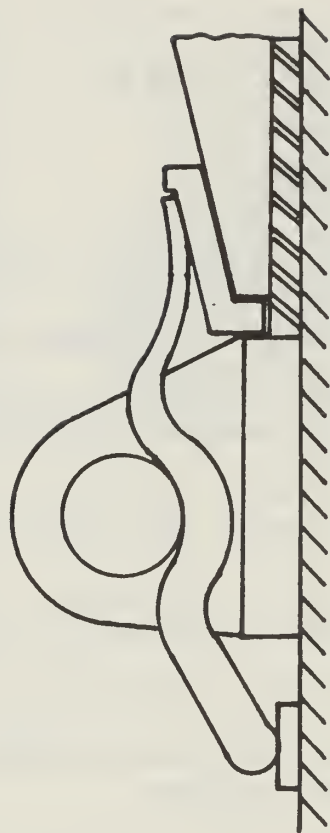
EXAMPLES OF CONCRETE TIE FASTENERS
